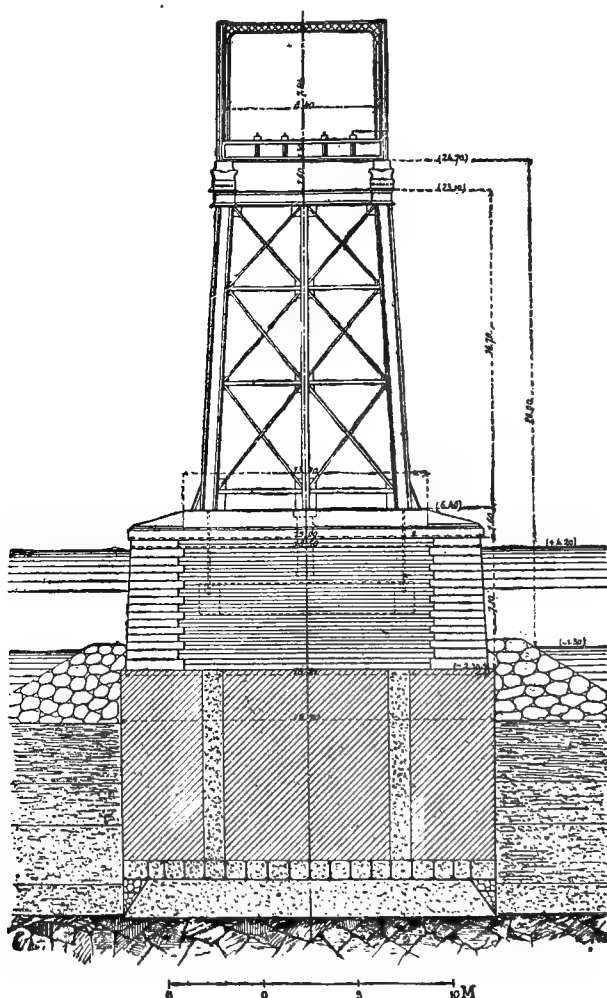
Elevation of an iron pier of the Cubzac bridge.
